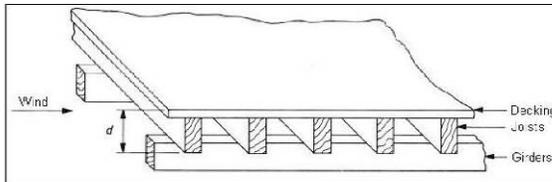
Case 2: wind parallel to girders
